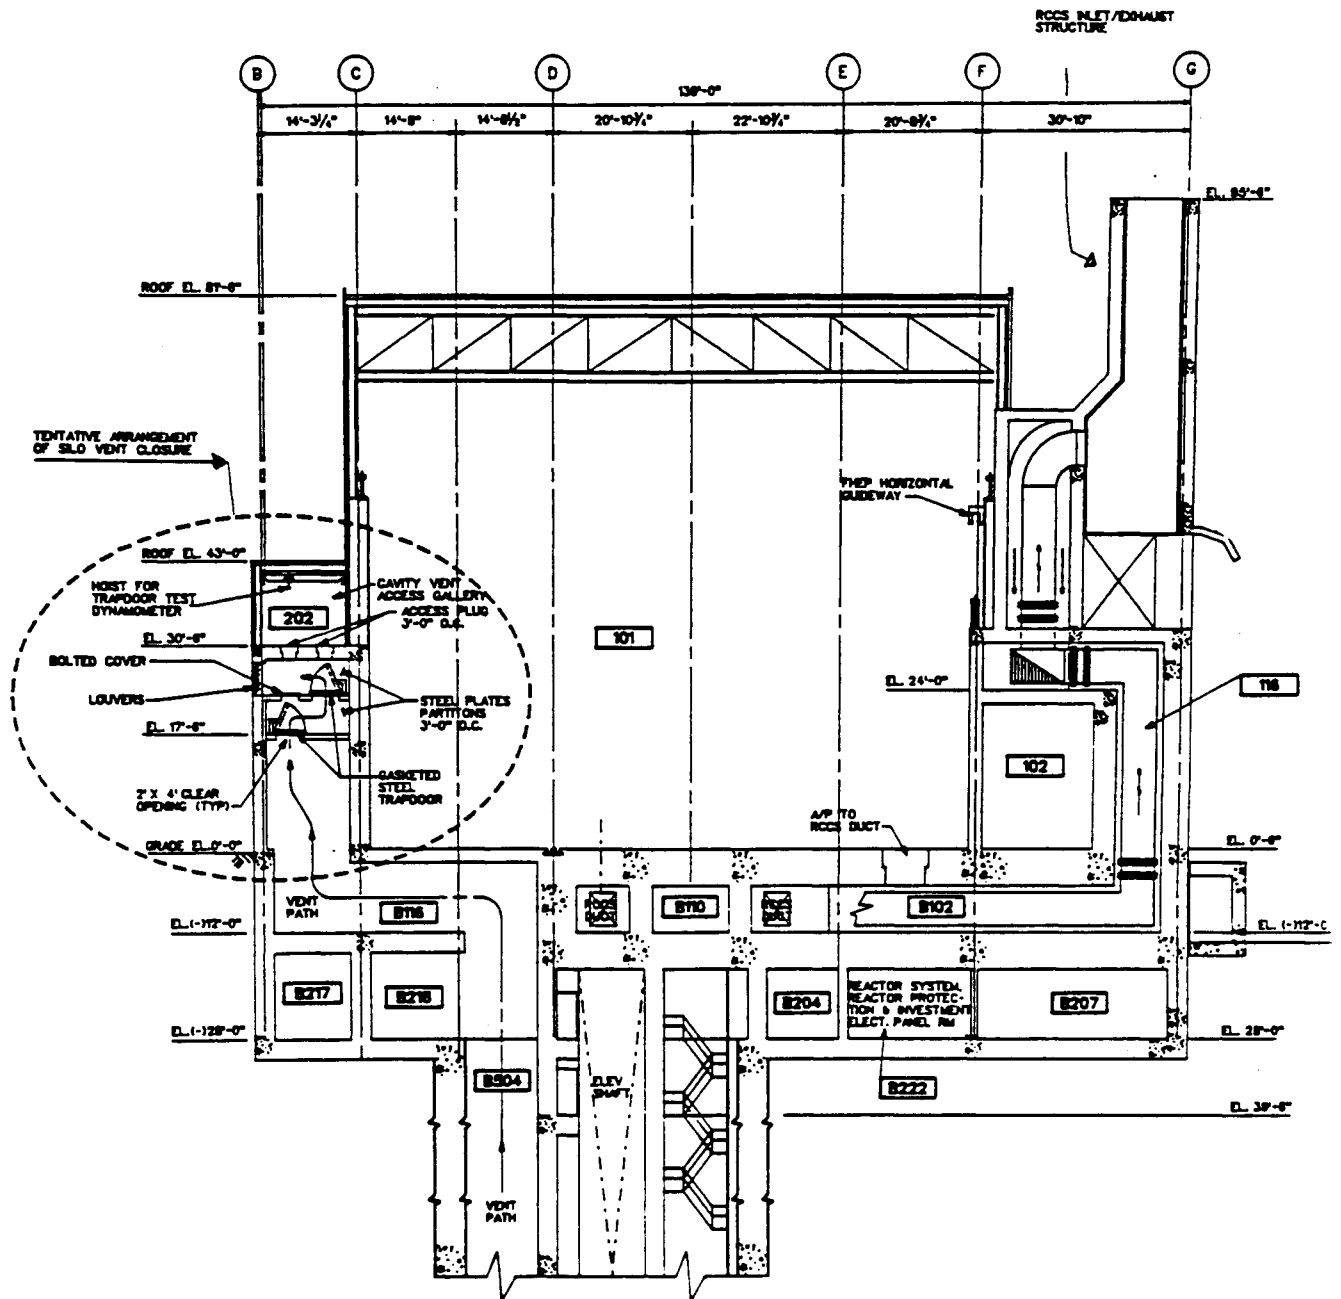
REACTOR BUILDING - ELEVATION THROUGH RCCS DUCT AND BUILDING VENT
